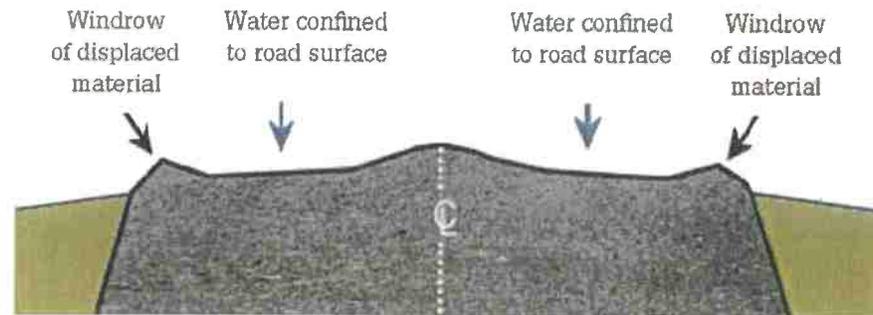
B. Centerline crown has become misshapen over time. Road surface drainage is trapped on the road by gravel movement, grader berms or by road rutting under heavy traffic. Road drainage travels down the rutted road surface causing erosion, loss of road material, and increased maintenance. The road can be reshaped to restore cross drainage, but rolling dips are needed for effective, permanent surface drainage (Center for Dirt and Gravel Road Studies, 2005)
